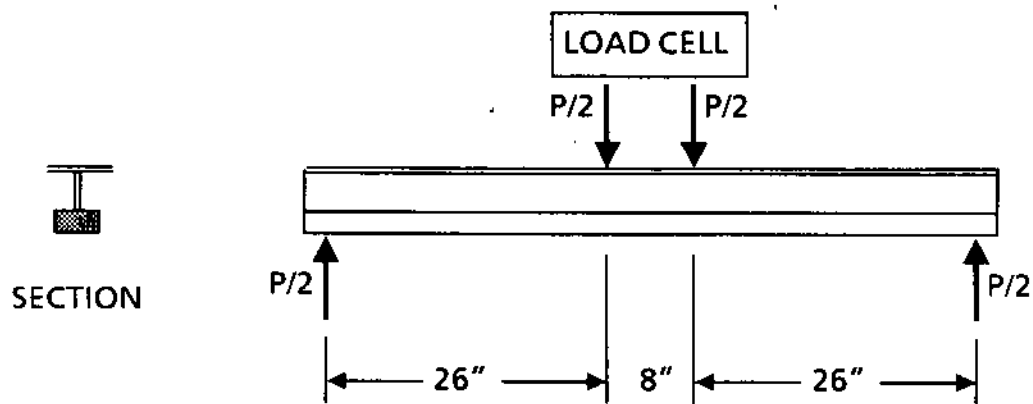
SCHEMATIC OF BENDING TEST FIXTURE
